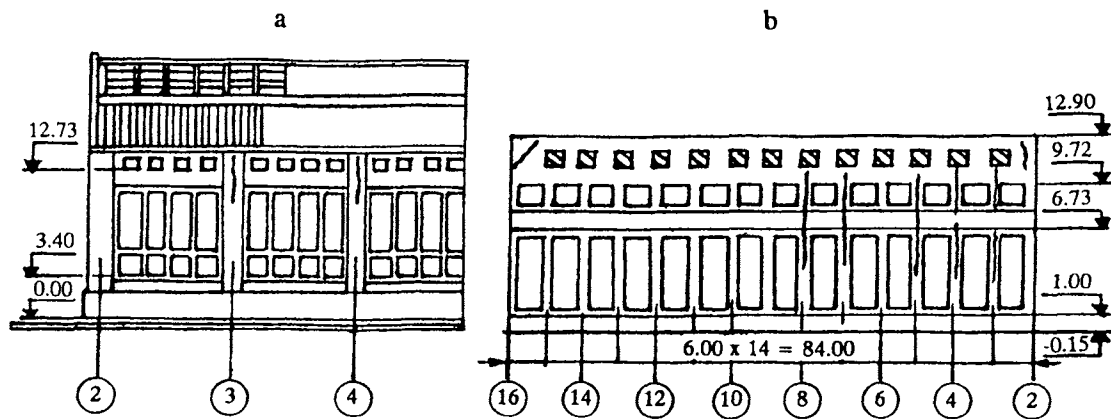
Elevations of Exterior Walls of Forge Shops containing Hammer Foundations with Mass of Dropping Parts of 15 and 20 tonnes (a), and 1, 2, and 3 tonnes (b)
